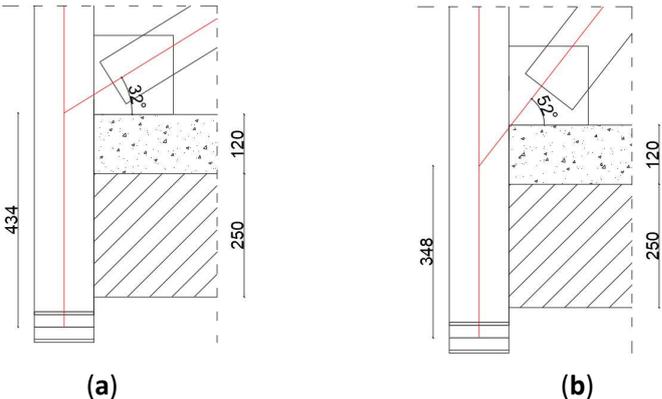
Lower bracing eccentricities using PFC-section support: (a) Single frame, (b) Double frame (own work).
